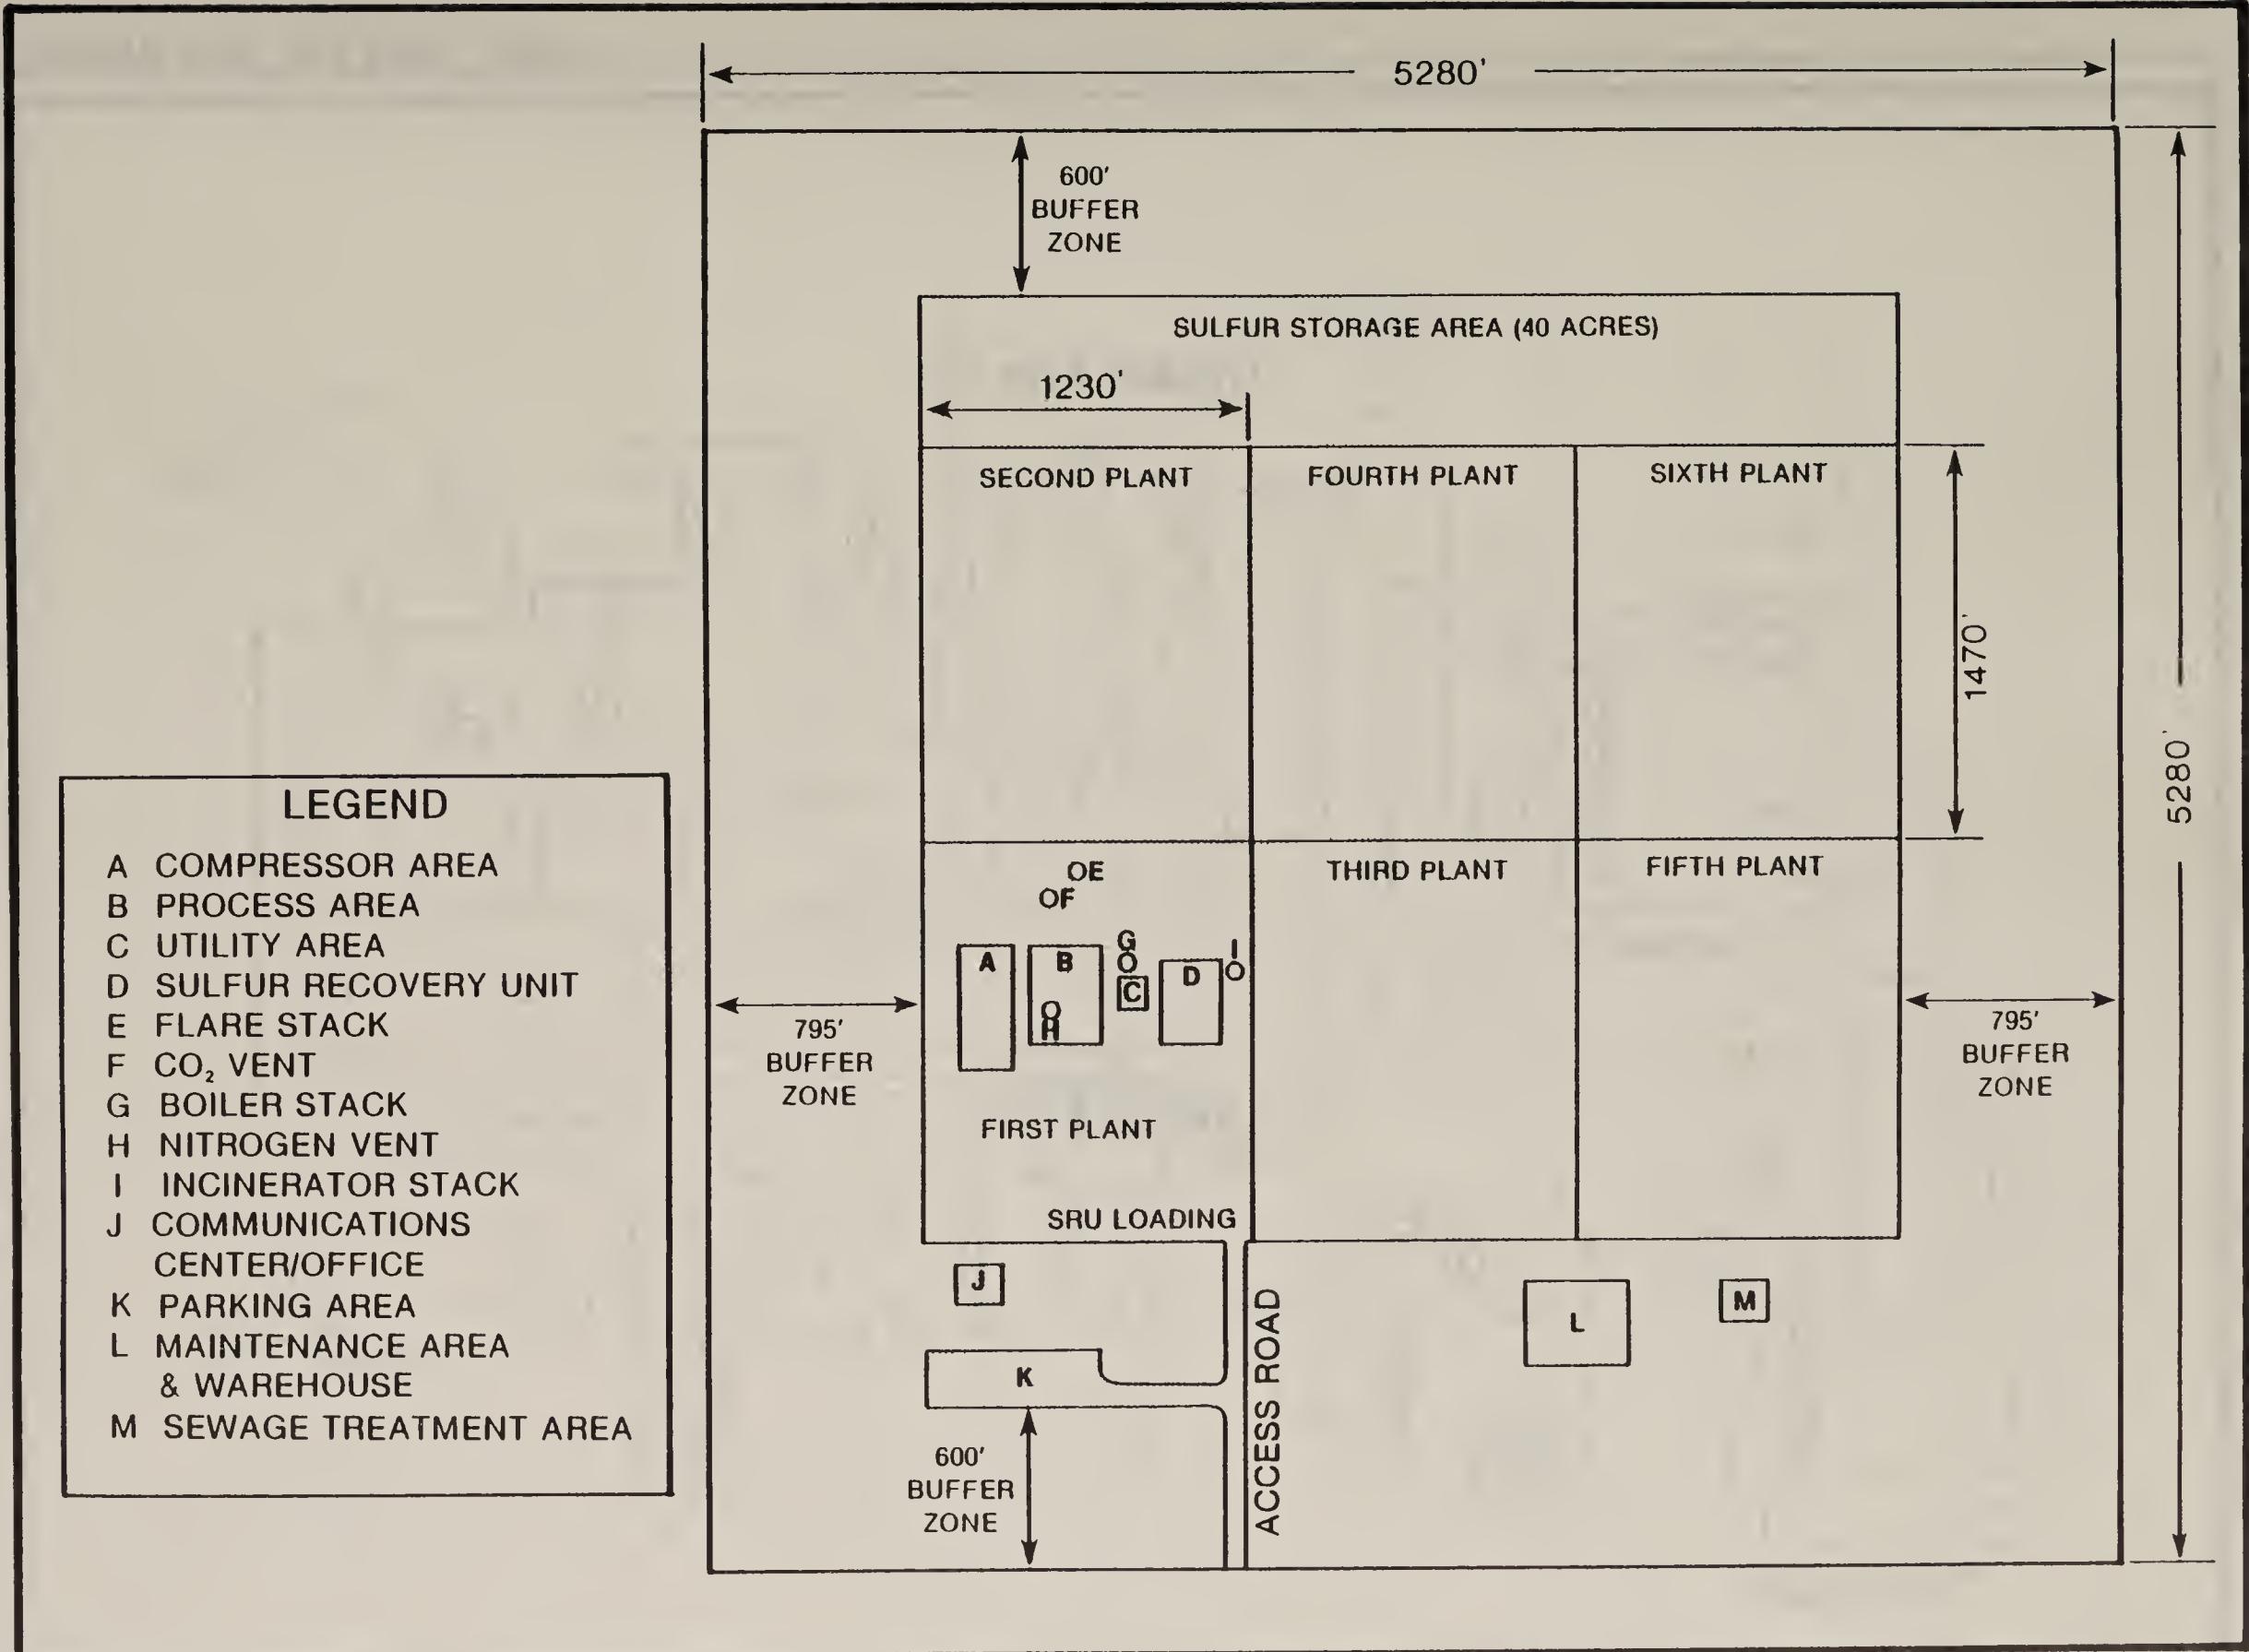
CONCEPTUAL SITE PLAN FOR A 1.2 BILLION CFD GAS TREATMENT PLANT
